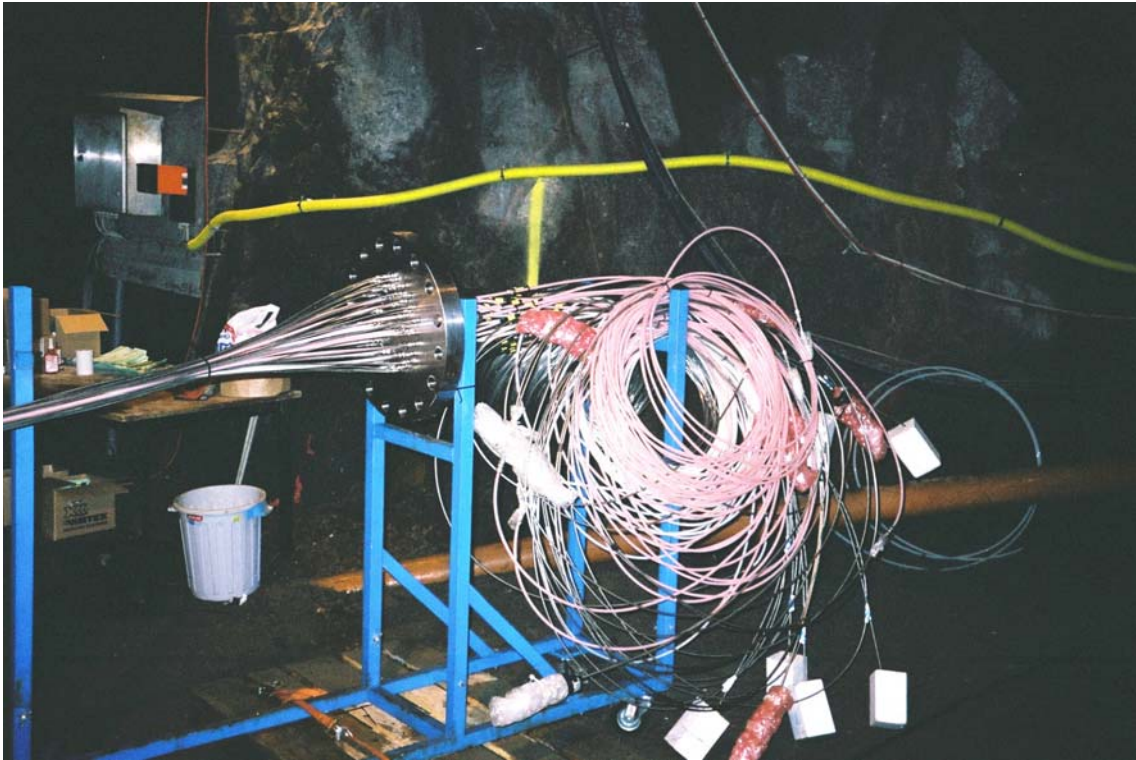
A photo showing the assembling of a cable parcel including cables from the buffer and backfill.
